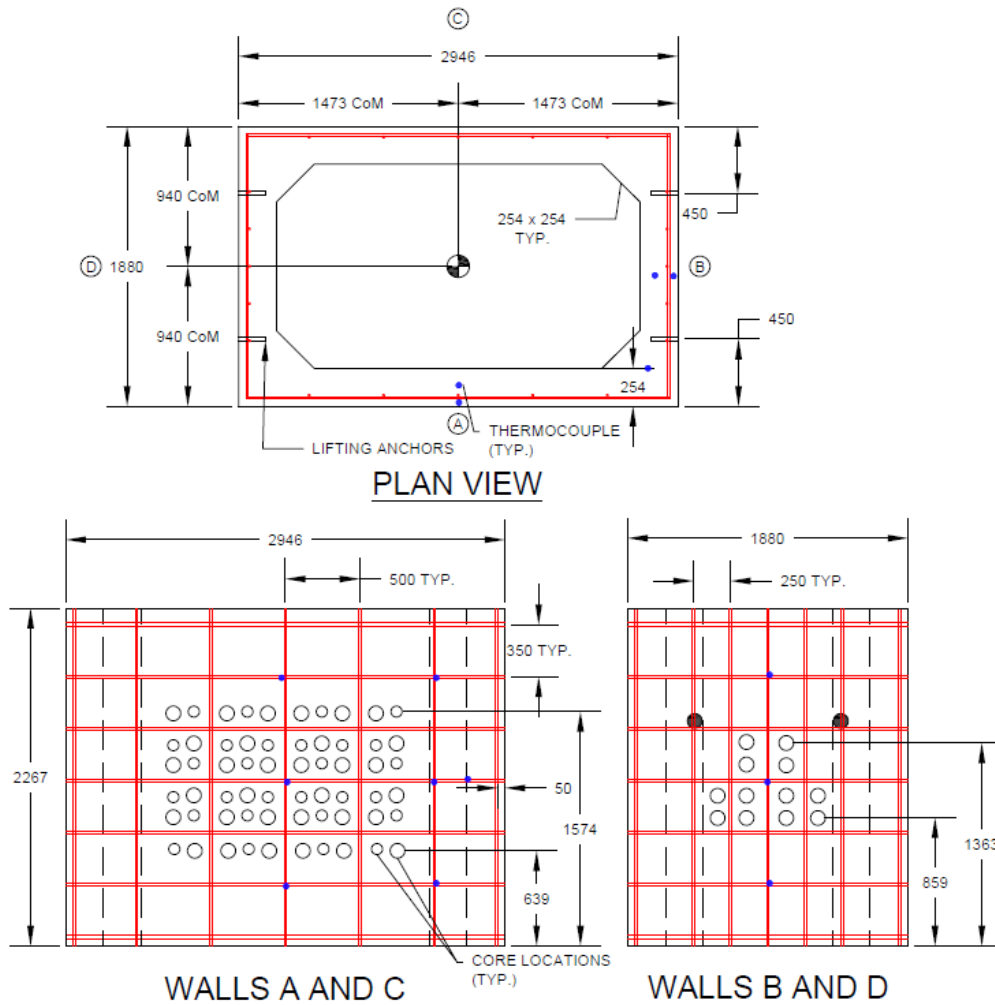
Valve Chamber (VC) Shape, Dimensions, Reinforcement Layout, and Approximate Coring Layout
